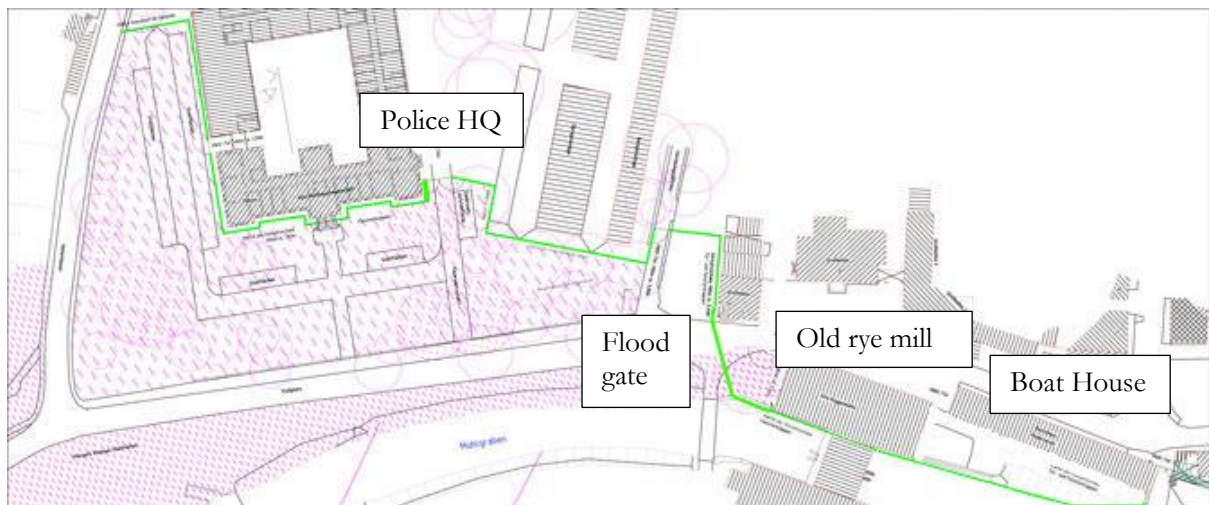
Project 1, floodwall (source: hochwasserschutz-grimma.de).
